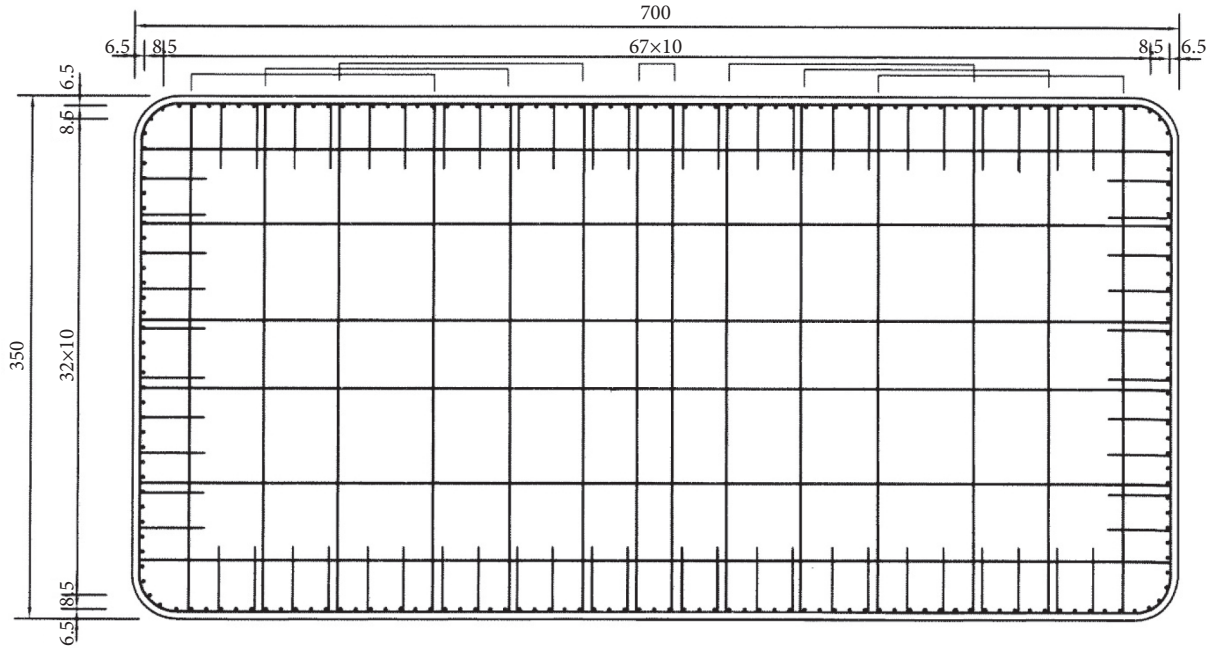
Reinforcement layout of the pier bottom section (dimension units: cm).
